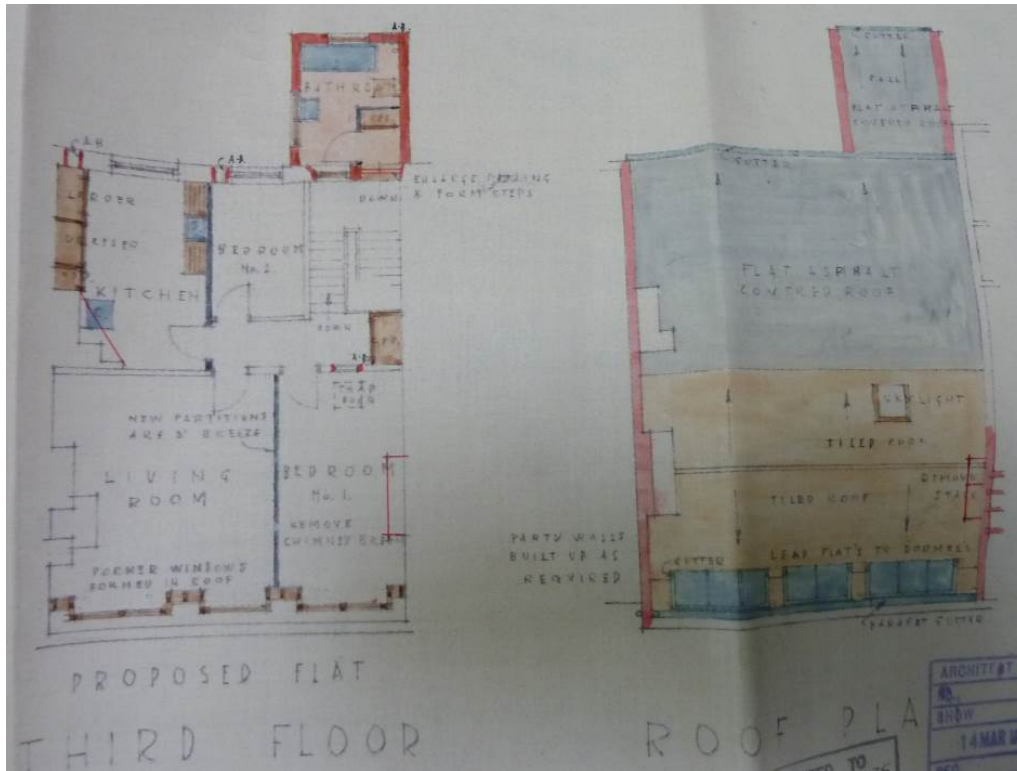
Proposed third floor and roof plans, J. Mackie Murray ARIBA in conjunction with Lawrence Farman FRIBA, February 1947 (LB Camden, planning file)
